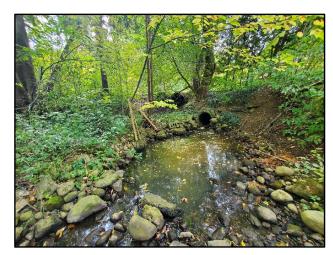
735 Hidden Valley Road Driveway crossing, view downstream
